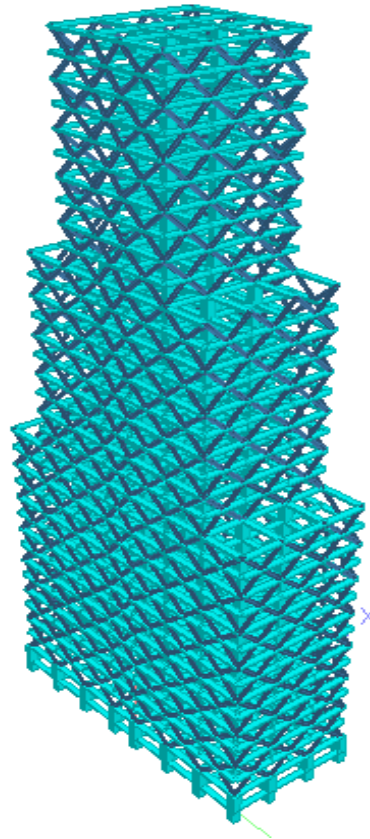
Geometric vertical irregular G+35 Building with Diagrid System elevation
